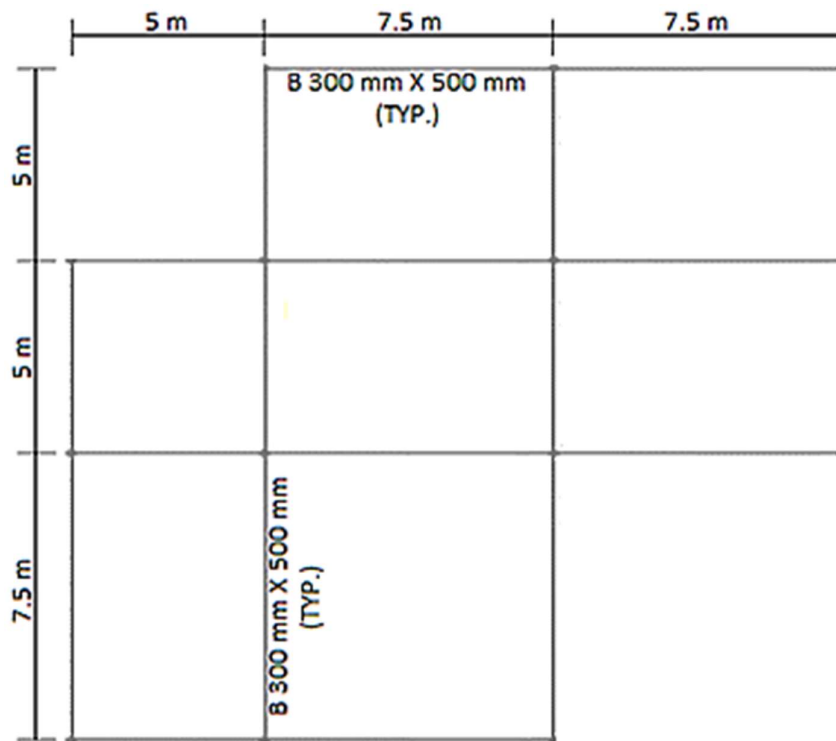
4th and 5th floor plan of the building with vertical irregularity
